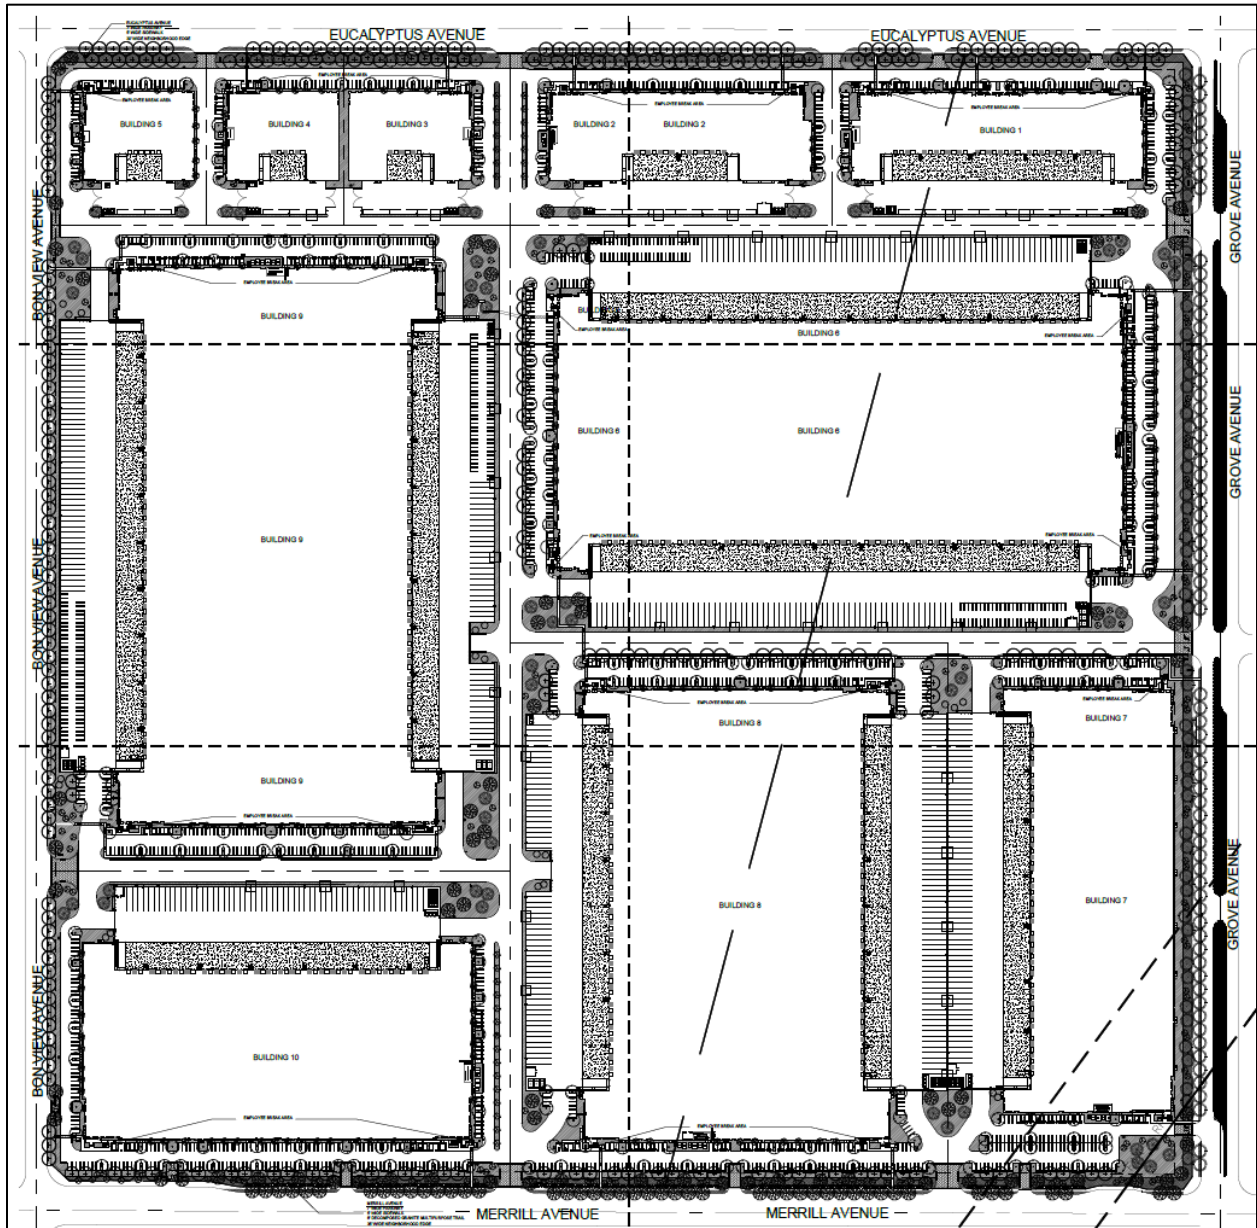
Exhibit H: CONCEPTUAL LANDSCAPE PLAN
